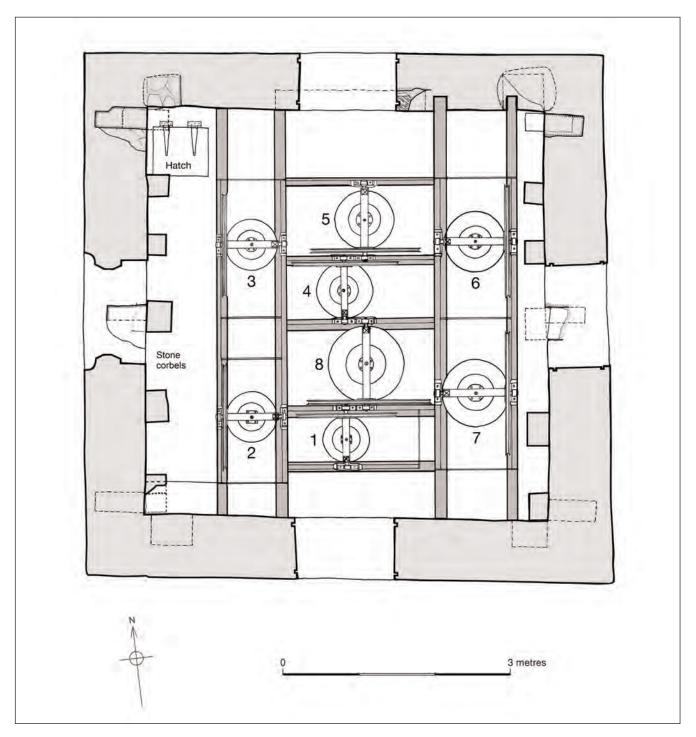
Tower. Plan of the interior of the belfry, showing the ring of eight bells in the steel frame of 1914. Note the projecting stone corbels along the east and west walls, which supported the medieval timber bellframe. Scale 1:50. Drawing: Stephen Coll
